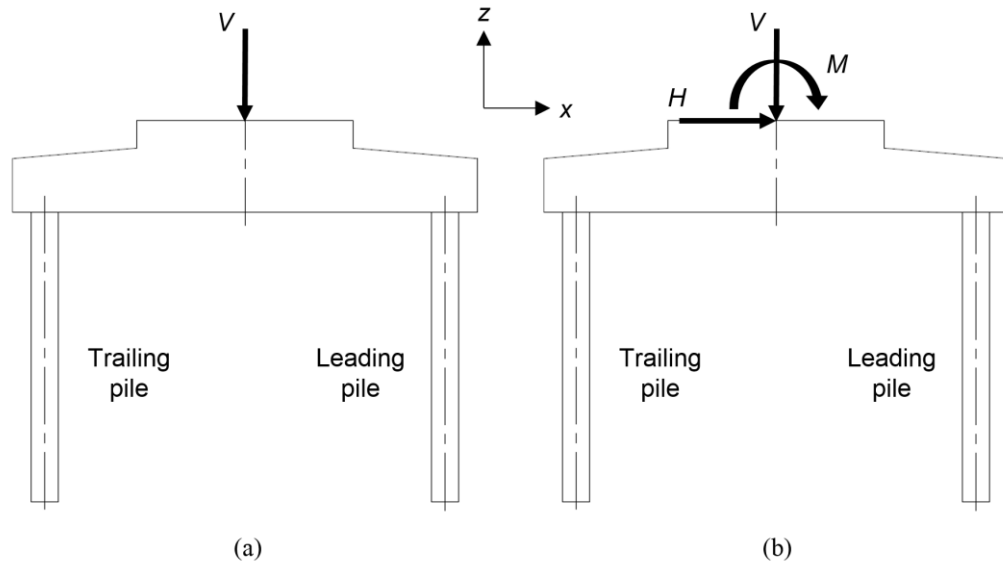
Load cases: (a) vertical load (V); (b) vertical load, horizontal load and overturning moment (V - H - M)
